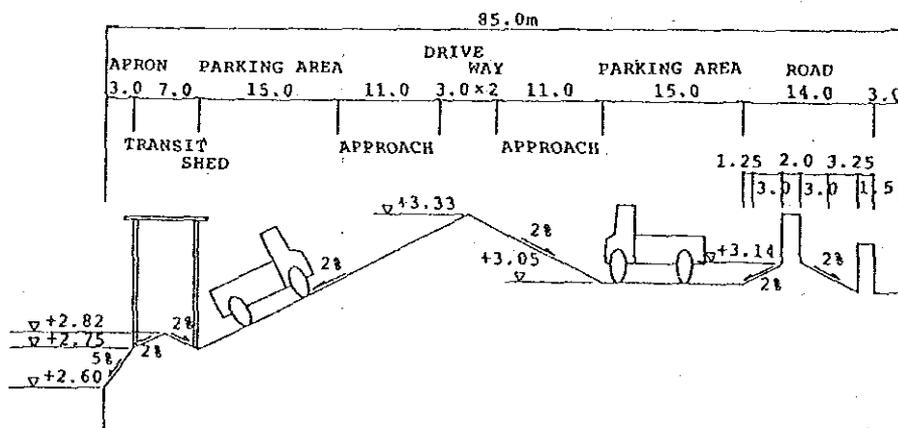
Typical Cross Section of Roads Behind Transit Shed
